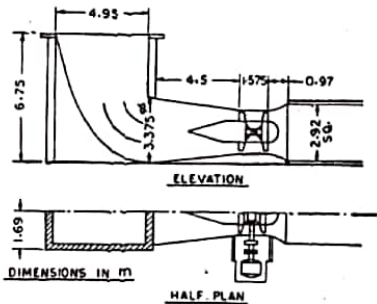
2275mm dia contrarotating axial-flow fan driven through gear box by a 132 kW motor (after MacFarlane).
